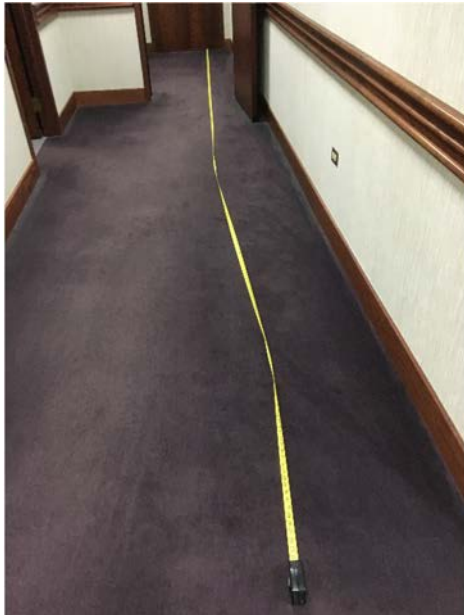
B-922 Director's Area – Before Construction.
